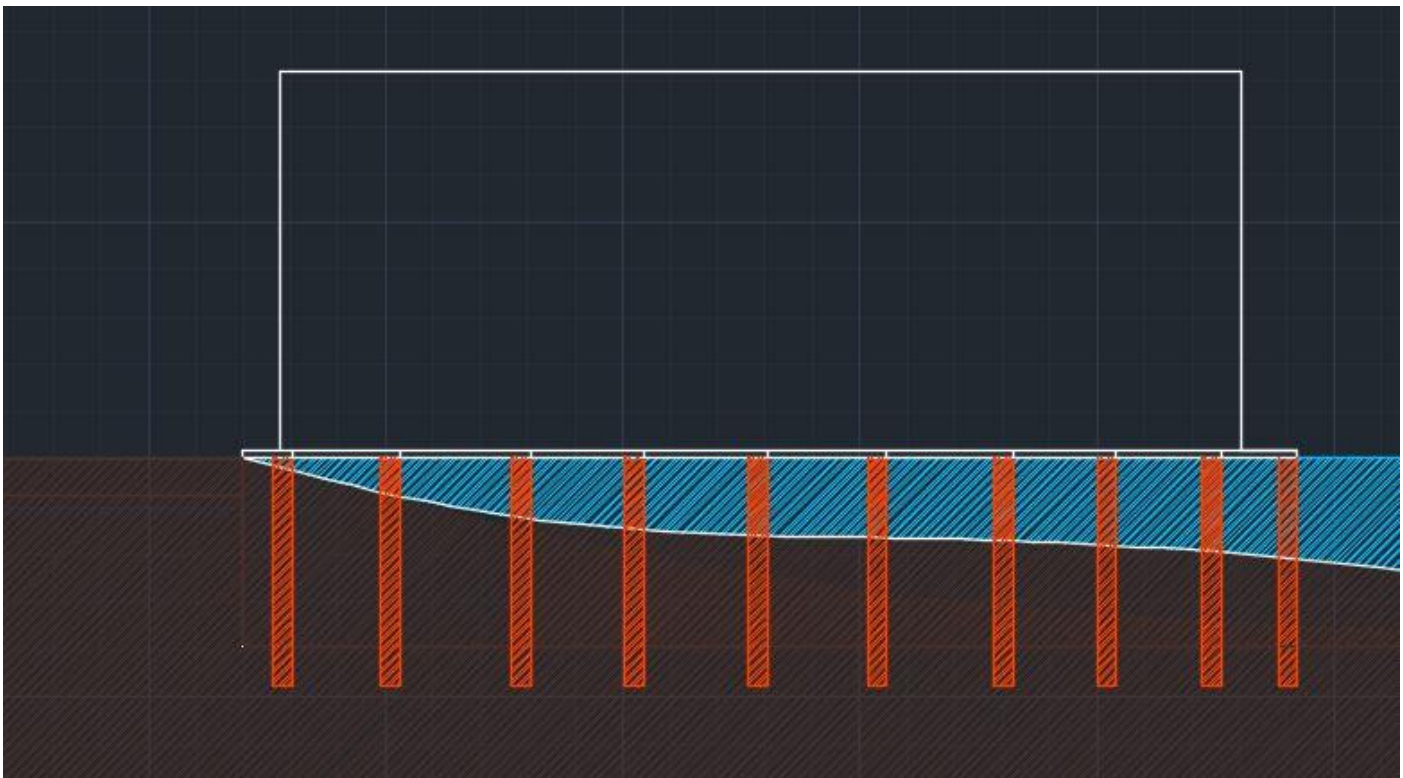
Elevation showing berth and piles. (Note to Scale)
